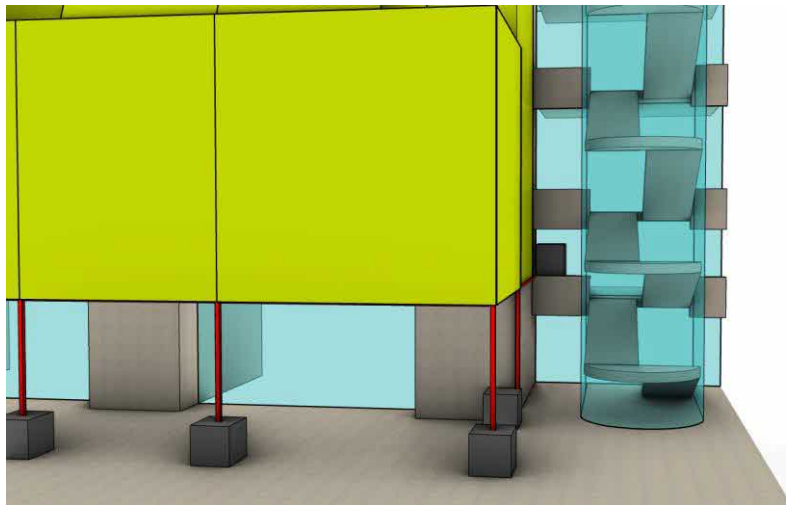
Ground floor East emergency exit. Kentledges moved left and to 1st floor balcony to prevent obstruction
